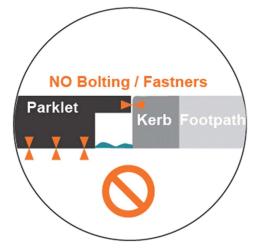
Structures must not be fixed to the pavement or the kerb upstands.
